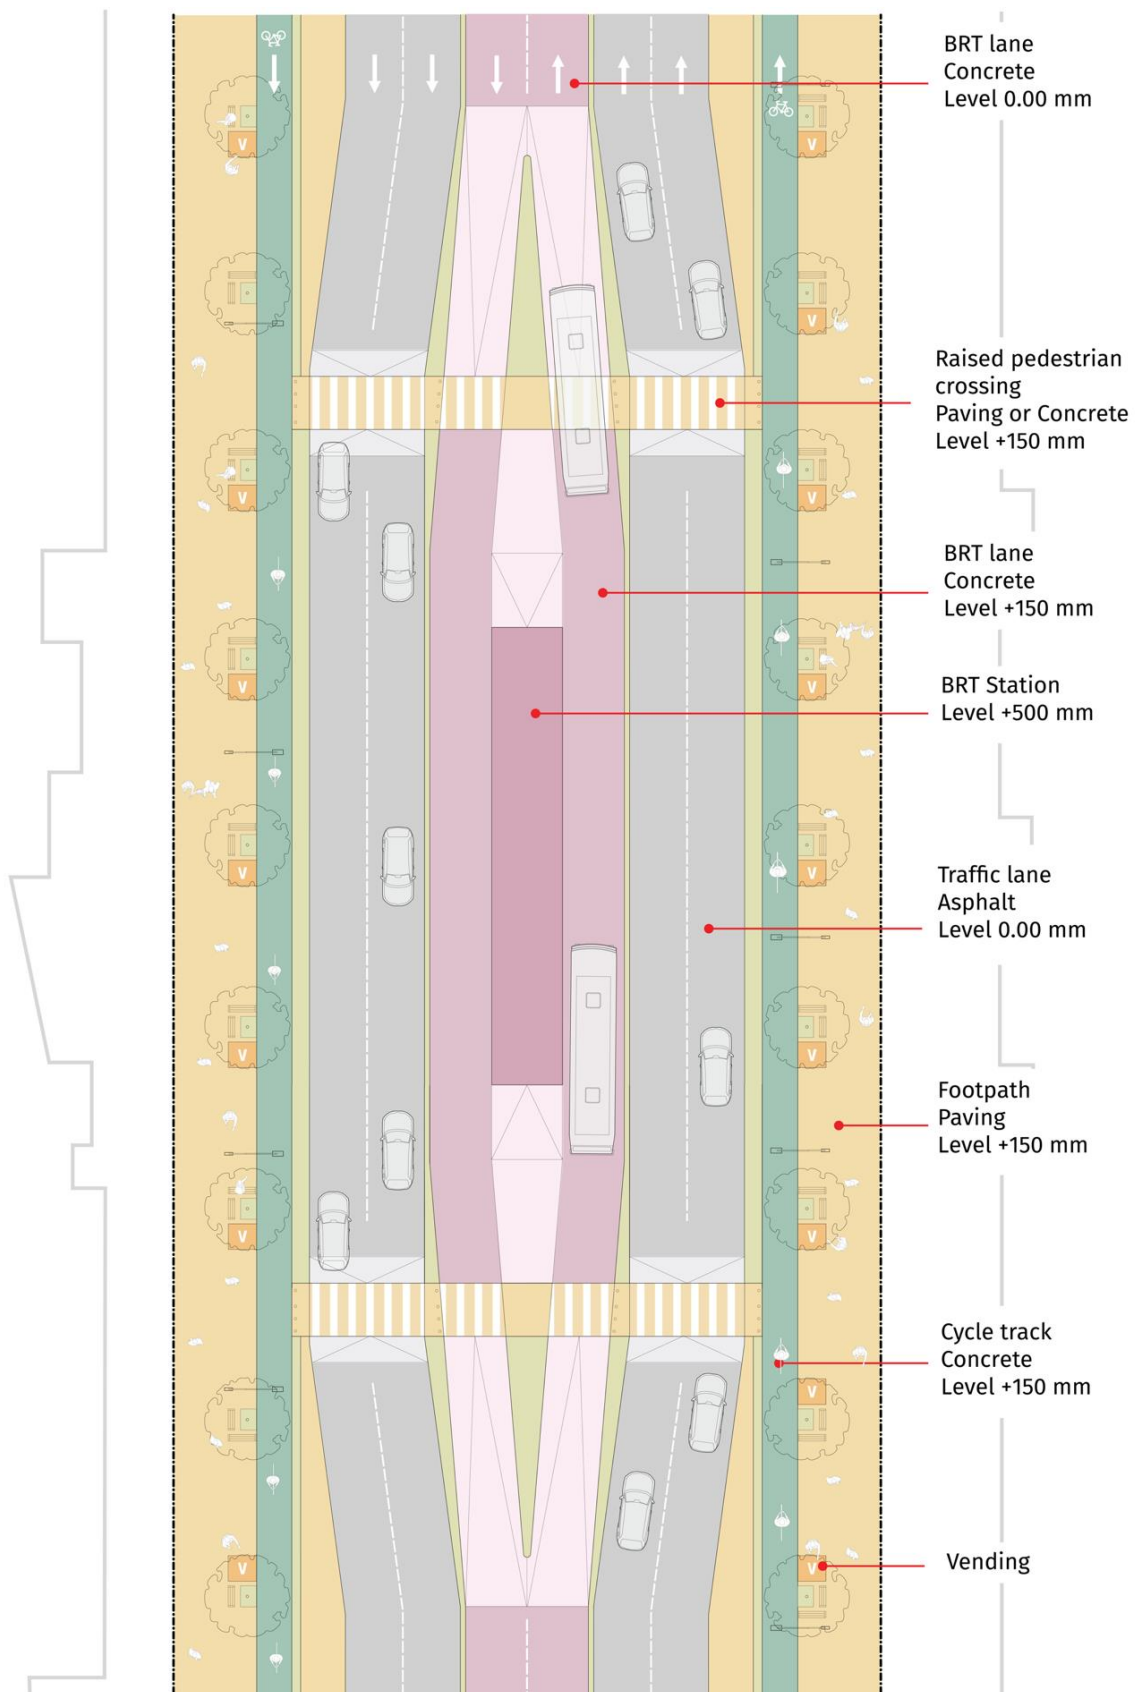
Safe pedestrian crossings are key to facilitating access to BRT systems. BRT lanes are elevated at station locations to match the height of the tabletop crossings.
